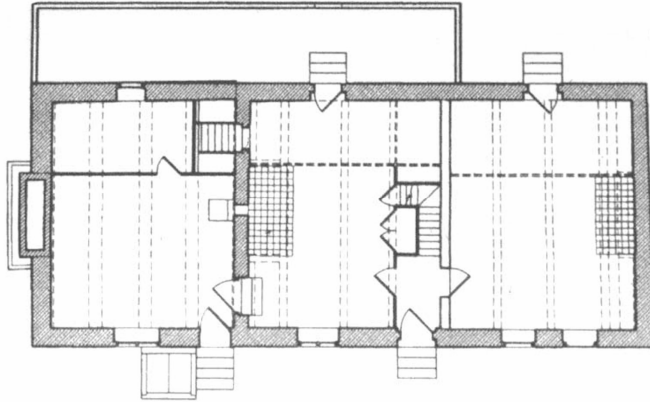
Floor plan of Daniel Hasbrouck House, New Paltz, N.Y. A typical example of the three-room linear plan of better stone houses in the eighteenth century (Larson & Barricklo, 2003).
